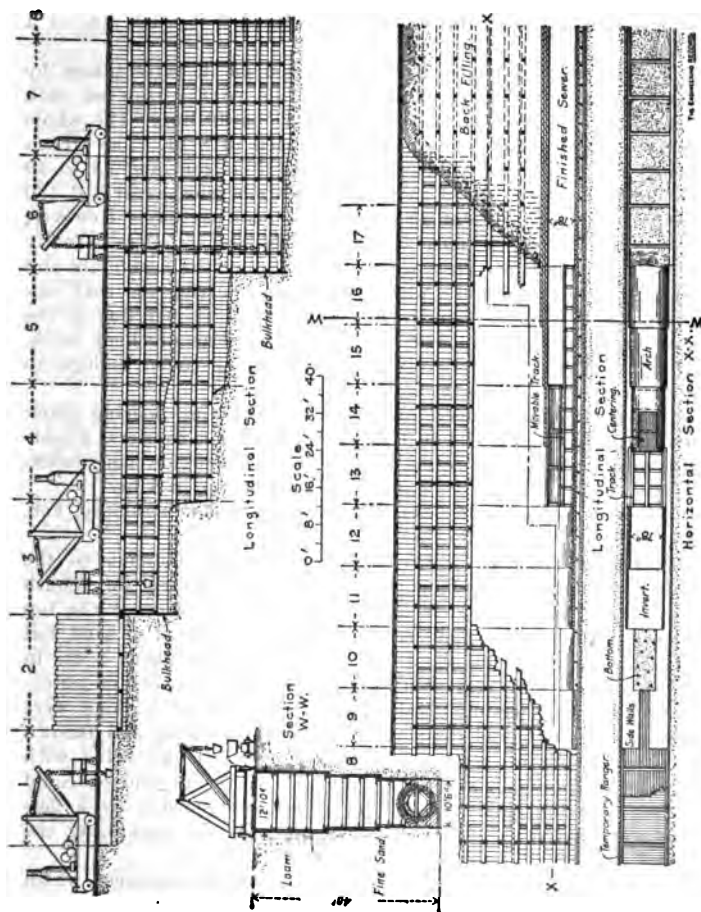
Plan of Work on Green Ave. Sewer, Brooklyn.
